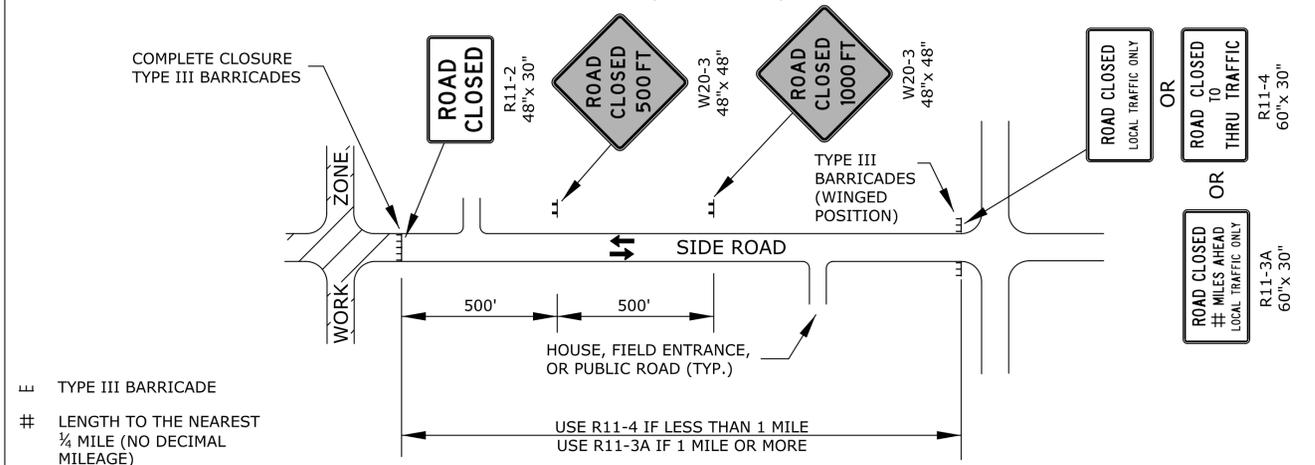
TYPICAL SIGNING FOR SIDE ROAD CLOSED
